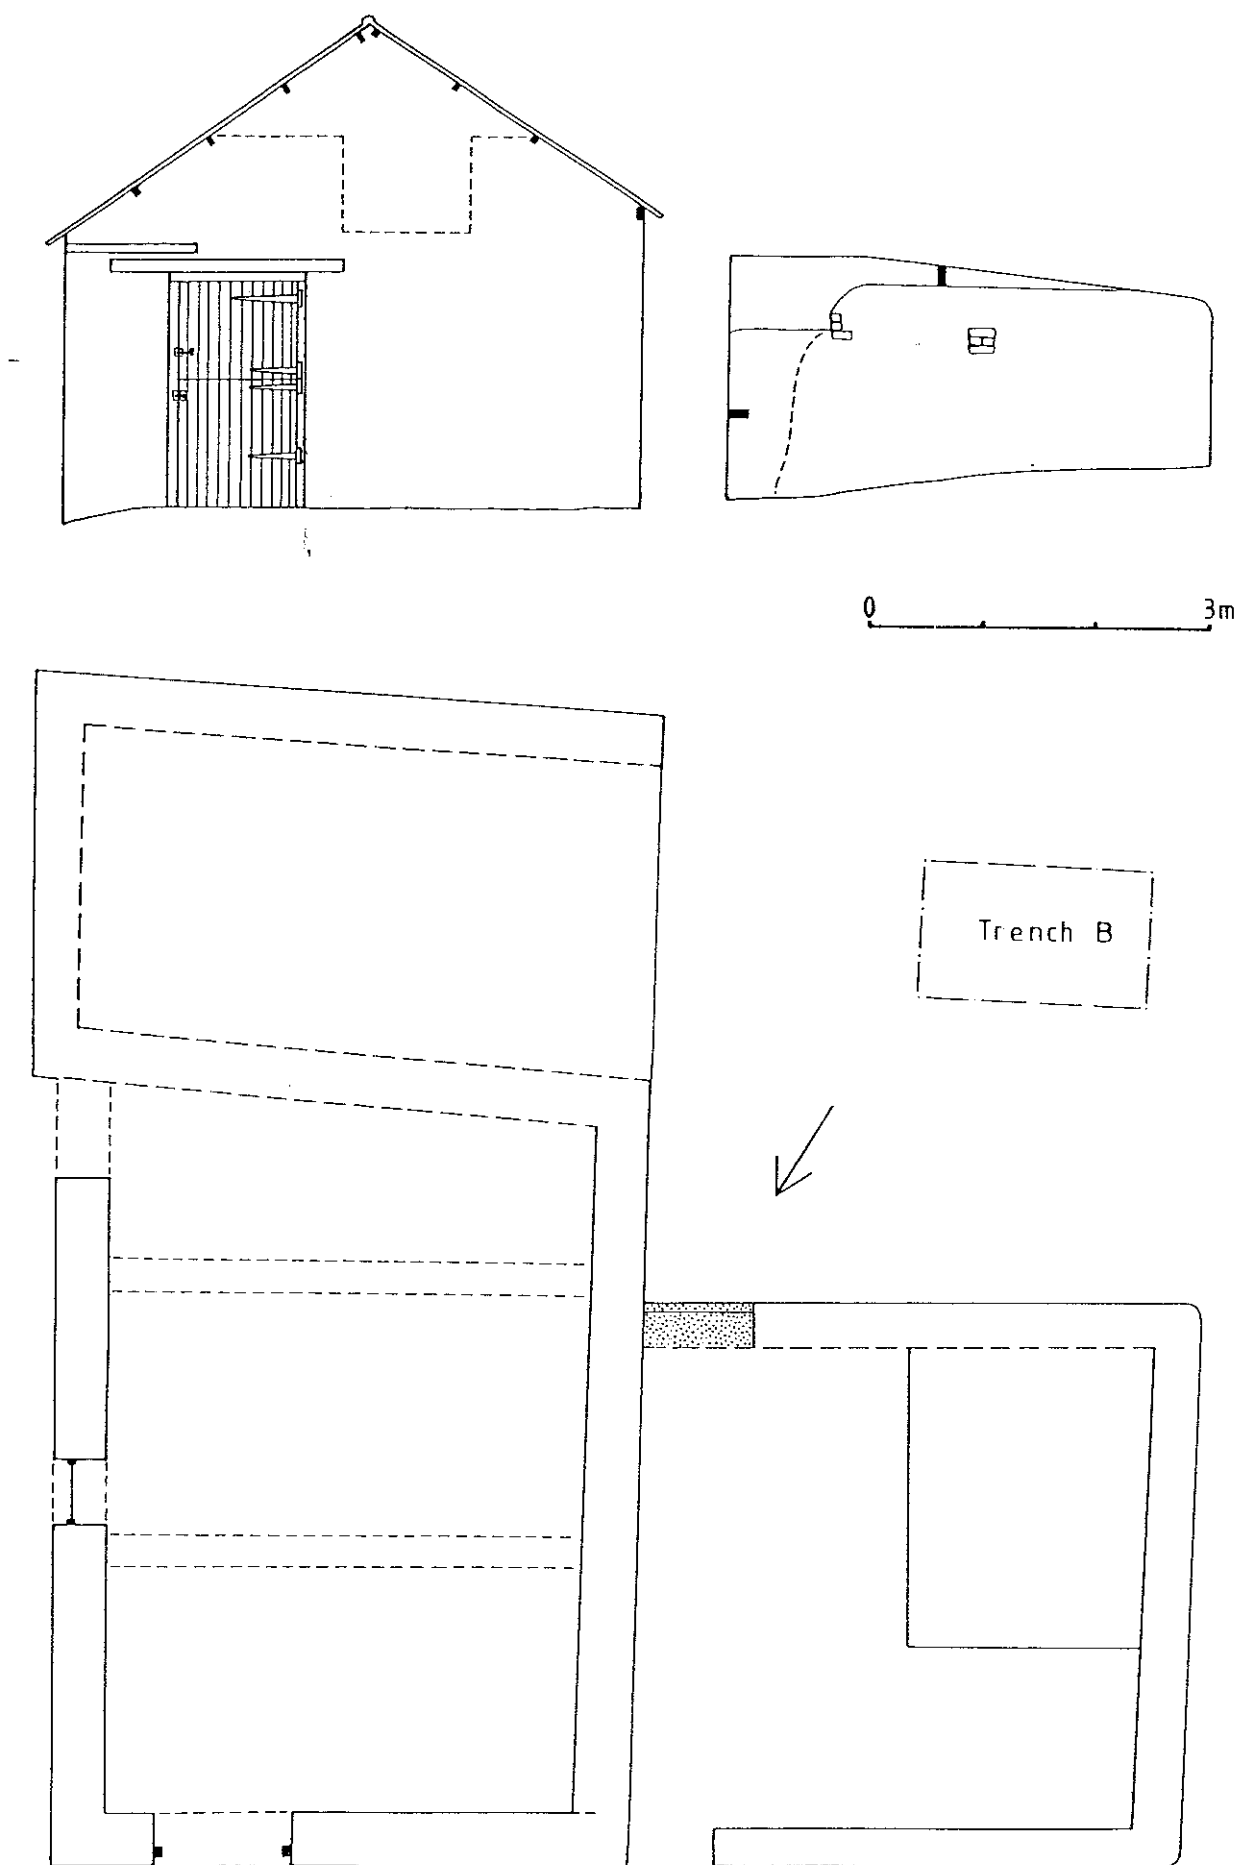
Plan and section of the Small Barn (Structure 3) at Ship Farm showing the location of trench B.
